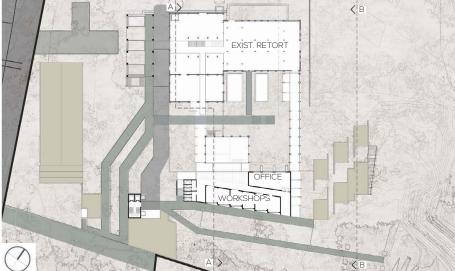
Iteration 5 First Floor Plan - June crit (Author 2017)
